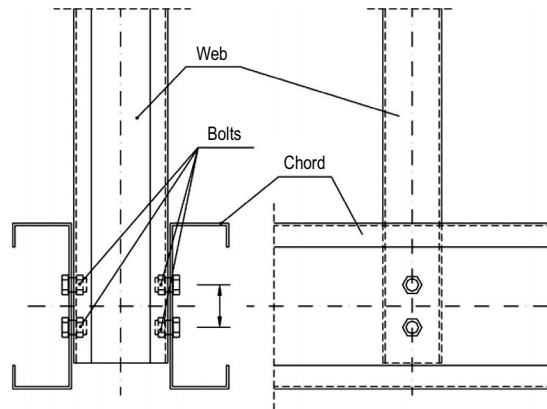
Cold formed steel truss bolted connection (Zaharia, Dubina 2006)
